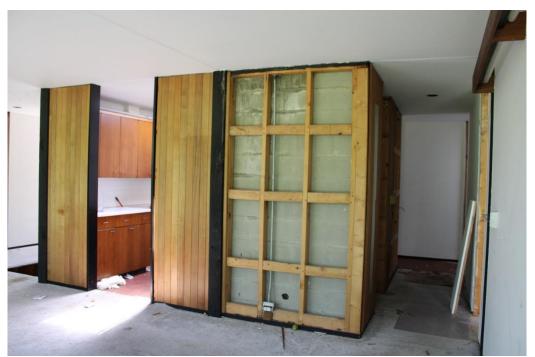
View from living/dining room toward kitchen and hallway (right) to master bedroom.
